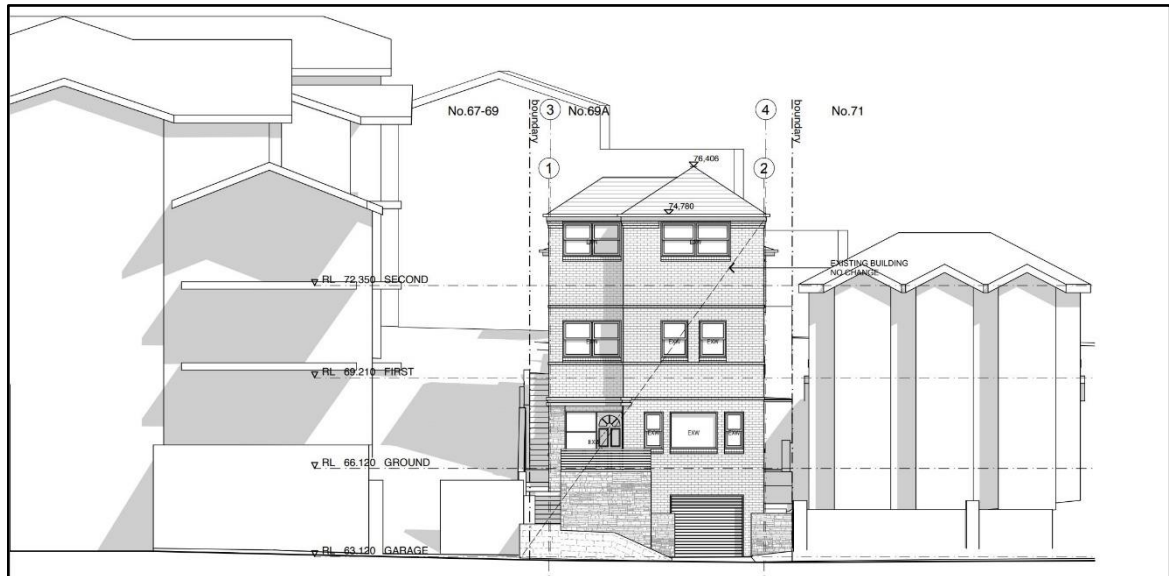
Street /South Elevation (Rev B), 2/11/2023 (Fortey & Grant Architecture)
